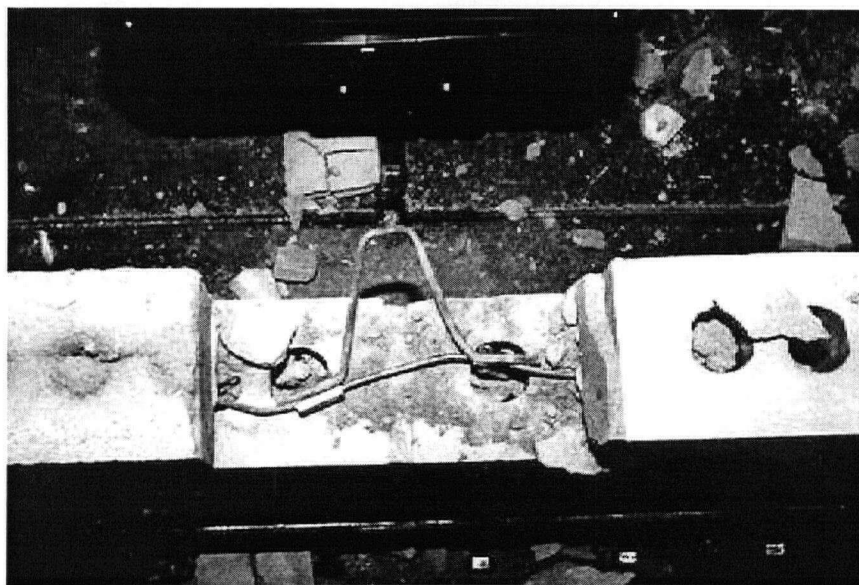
Photograph of a failed specimen with tie and horizontal joint reinforcement clipped, showing the unsymmetrical deformed wire.
